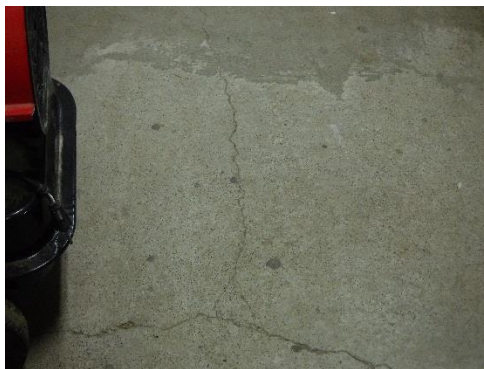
Cracks can be seen in the floor of the water treatment plant. The cracks have been formed by building differential settlement.
